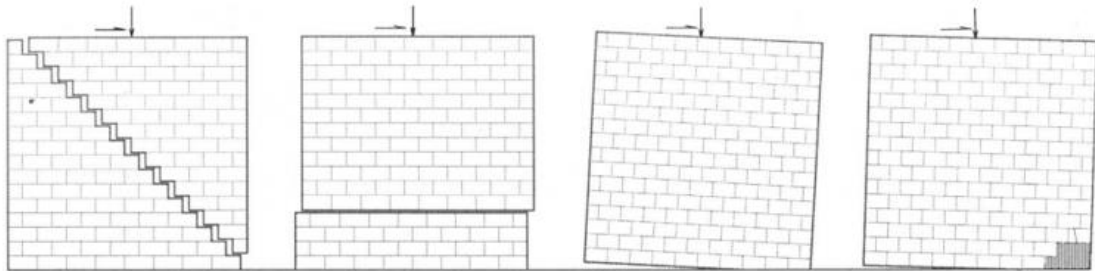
In-plane failure modes of a laterally loaded URM wall
